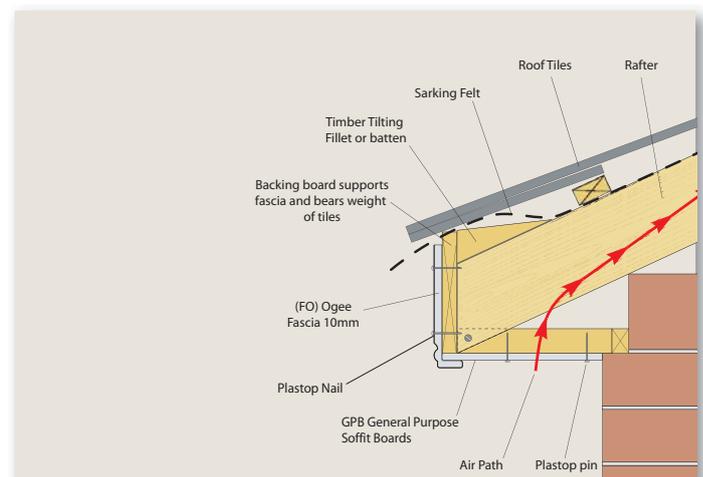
Refurbishment of pitched roof eaves and soffit, incorporating ventilation.
